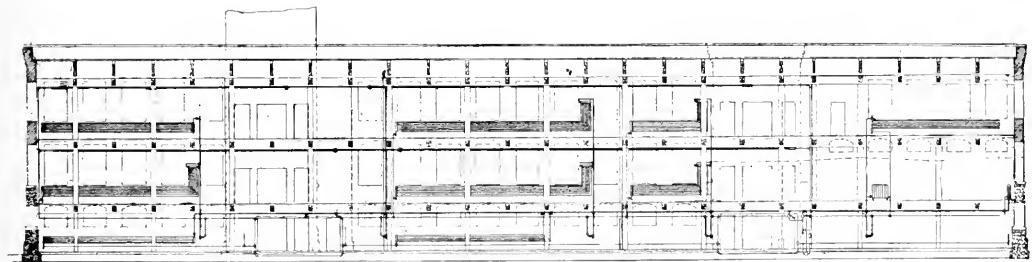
LONGITUDINAL SECTION OF MAIN BUILDING, LOOKING NORTH.
